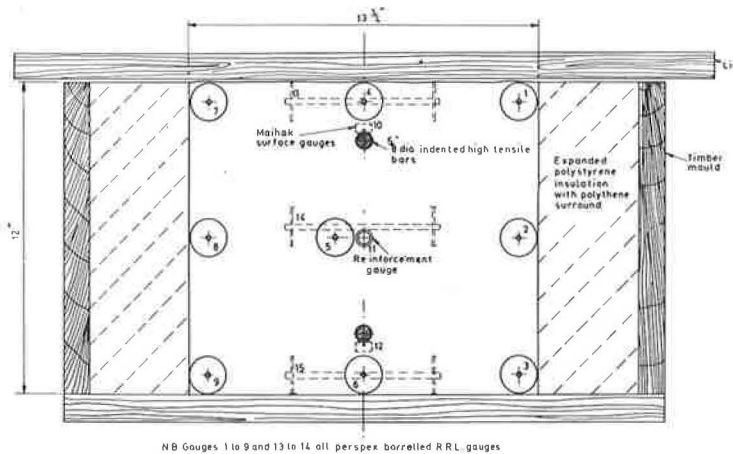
Cross section showing gauge positions, River Aire Bridge experiment.
